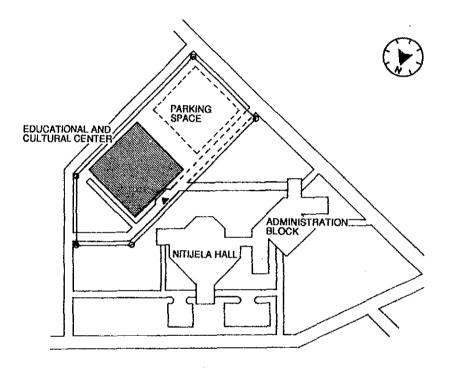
Outline of Layout Plan of the Educational and Cultural Center
